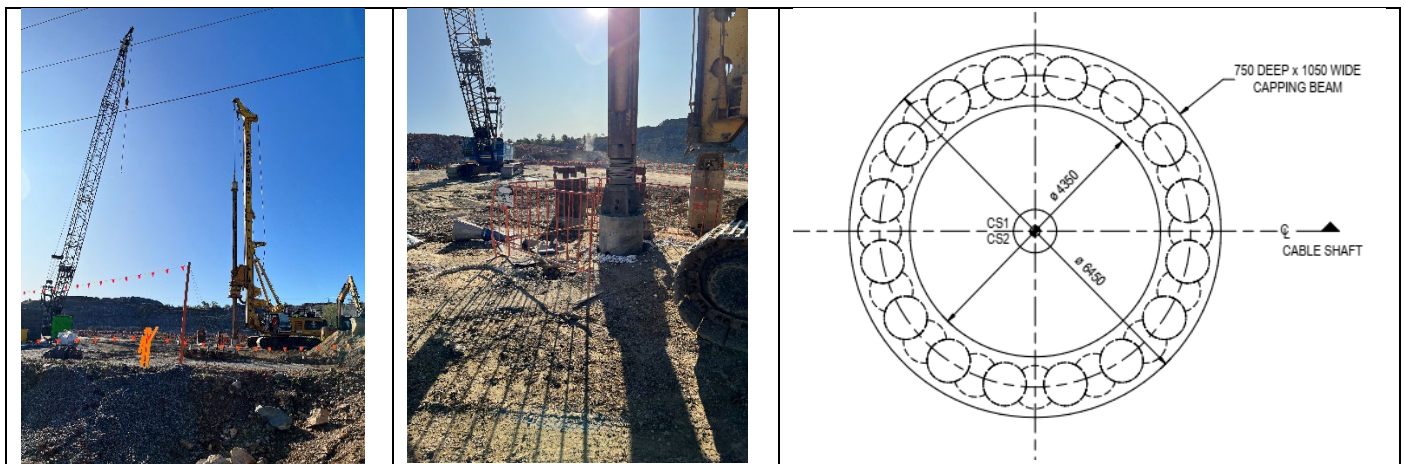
Typical Presink Operations (Photos left to right: Drilling Rig with service crane; drill cutter head for the piling; design arrangement of the secant piles)
